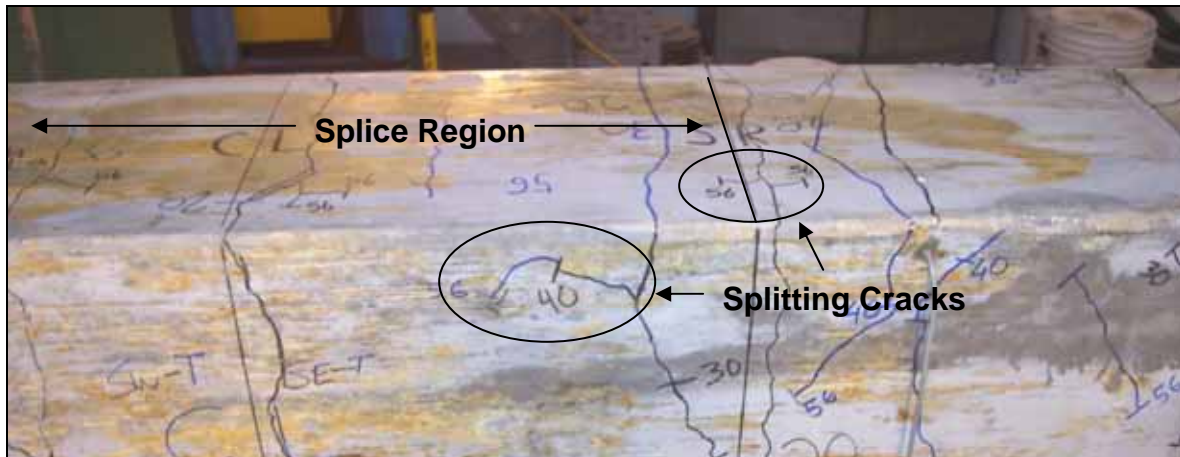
Splitting cracks in specimen 8-8-XC1-2.5 at 56 kips total load
